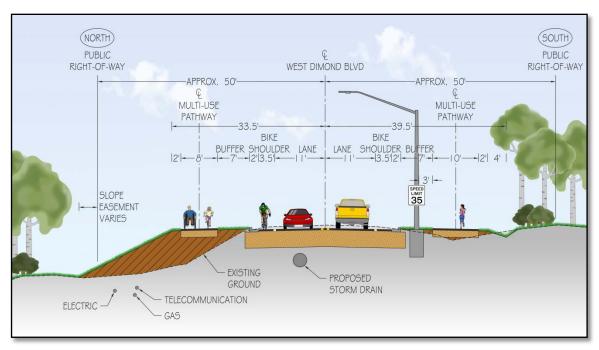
Curbed Typical Section – Jodhpur Street to Westpark Drive (preferred)
